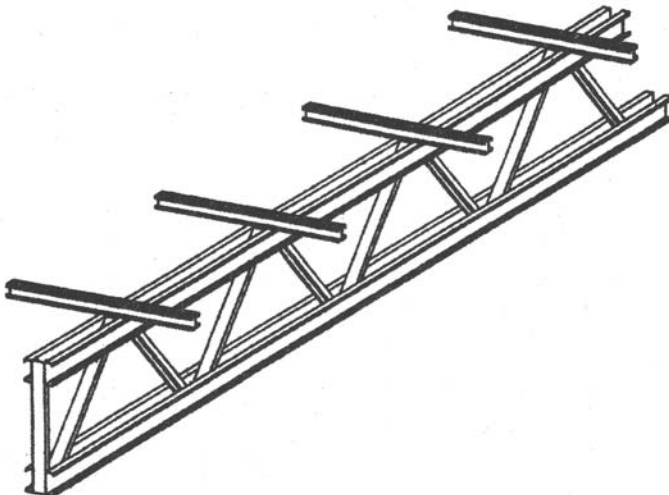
Built-up members – truss made of cold-formed C chords connected with bolted C stitches.
